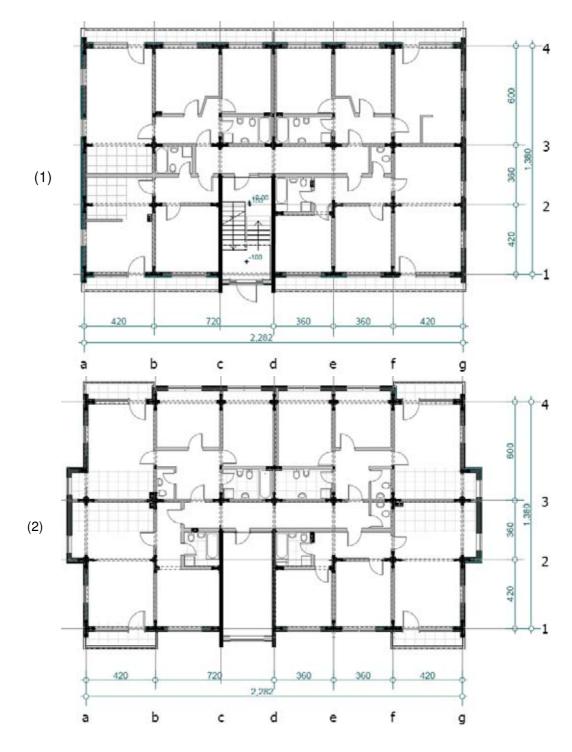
Ground floor (1) and characteristic floor (2) layout plan of Building 4
